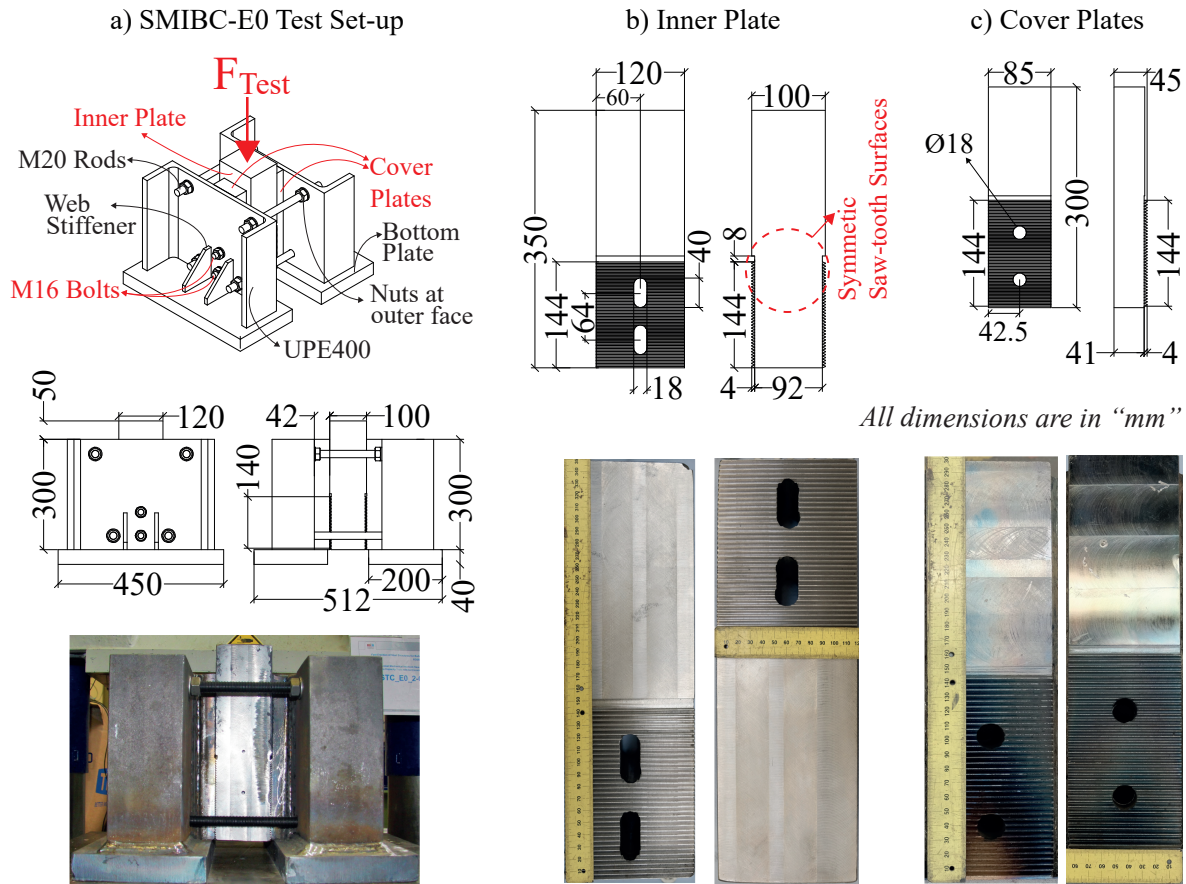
SMIBC-E0 test set-up and the technical drawings of the main set-up components.
